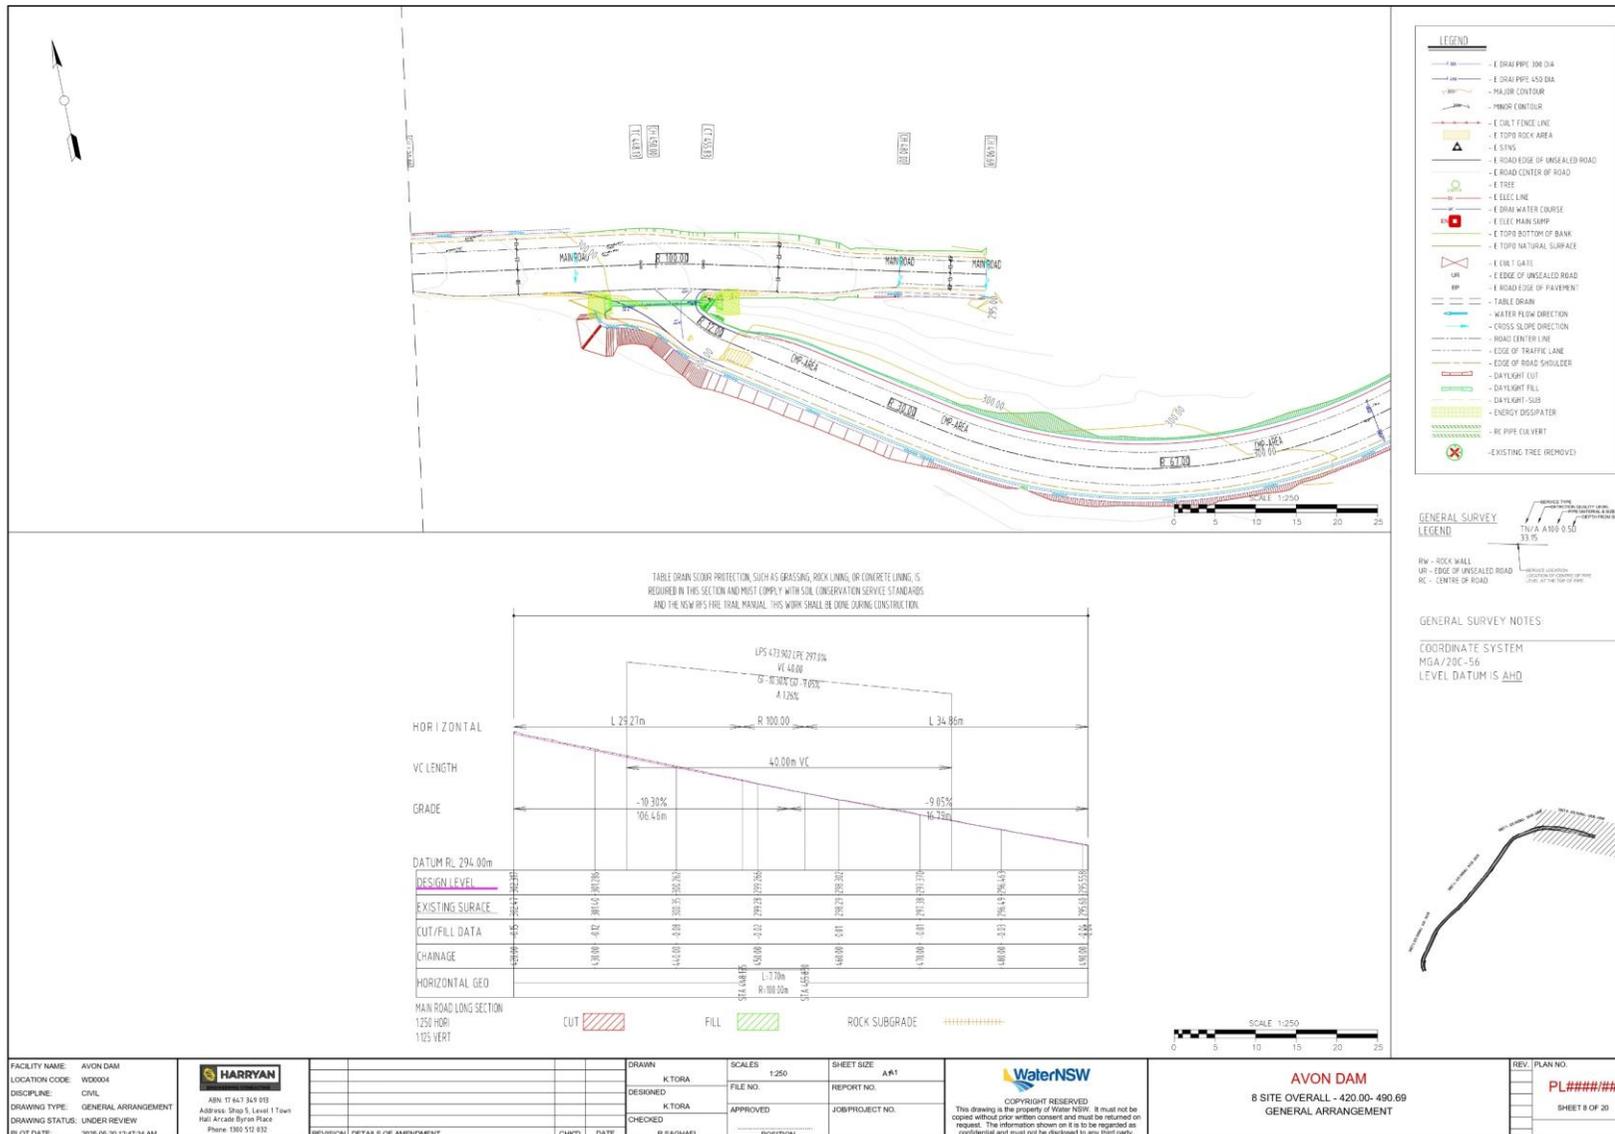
Map ID Section 1 (Main Road) proposed works overview Sheet 8 (Source: Water NSW, May 2025)
